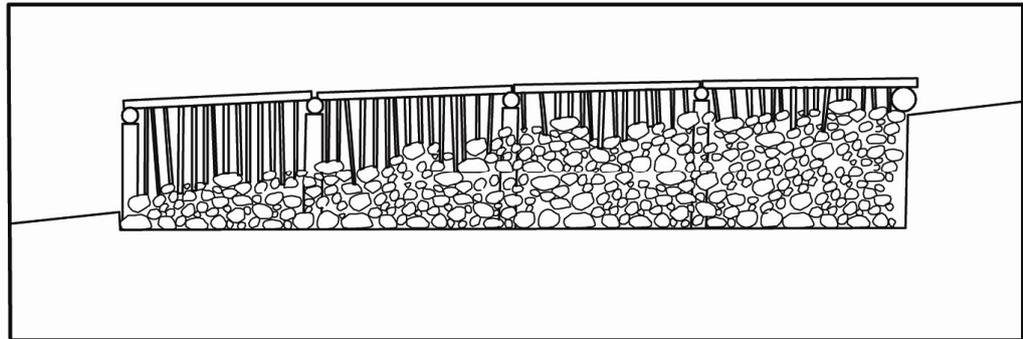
Construction process-step 6: Covering the side openings (View from east- the section of the House D showing the placement of thinner branches on the sides in order to both cover the side openings and to support the roof construction).
